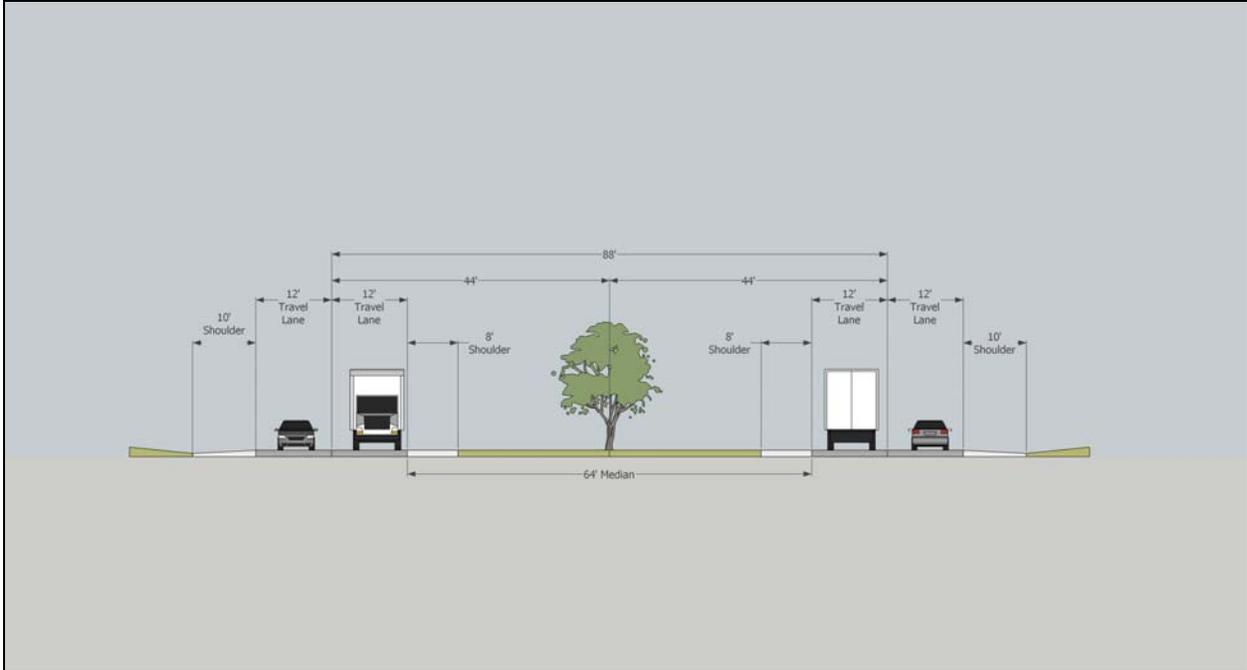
4-Lane Rural Arterial, Typical Section, Build Alternative B-1 and B-2 outside Walnut City Limits and Build Alternative C
